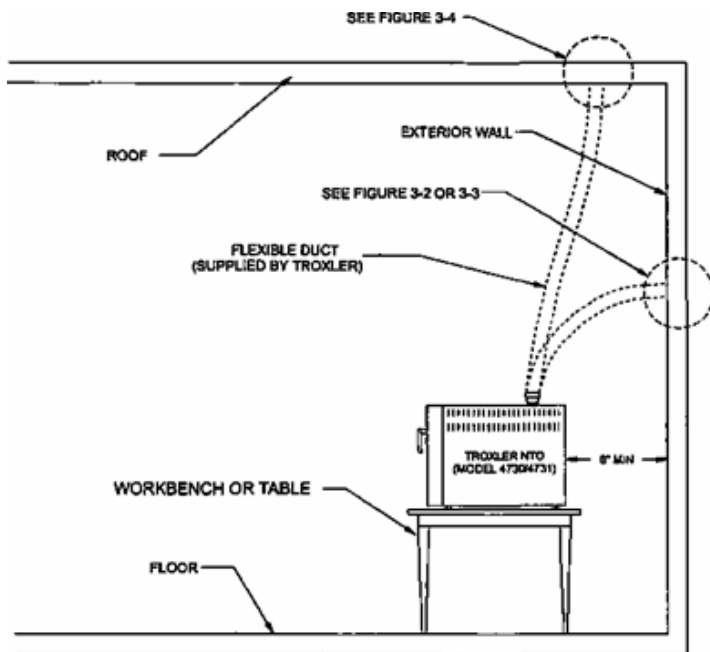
Overall Schematic for Exterior Wall and Roof Penetrations
